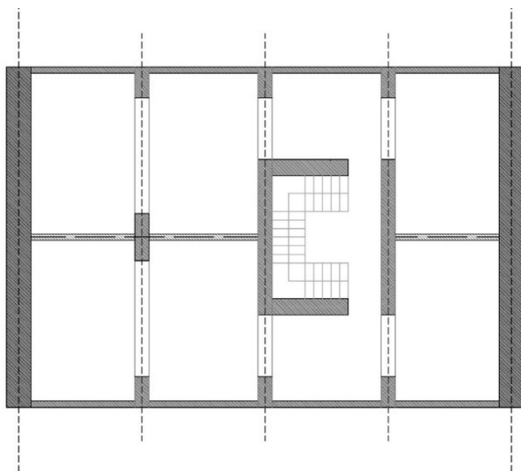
Diagram of type B building showing the structural system using load-bearing walls parallel to the façade.
